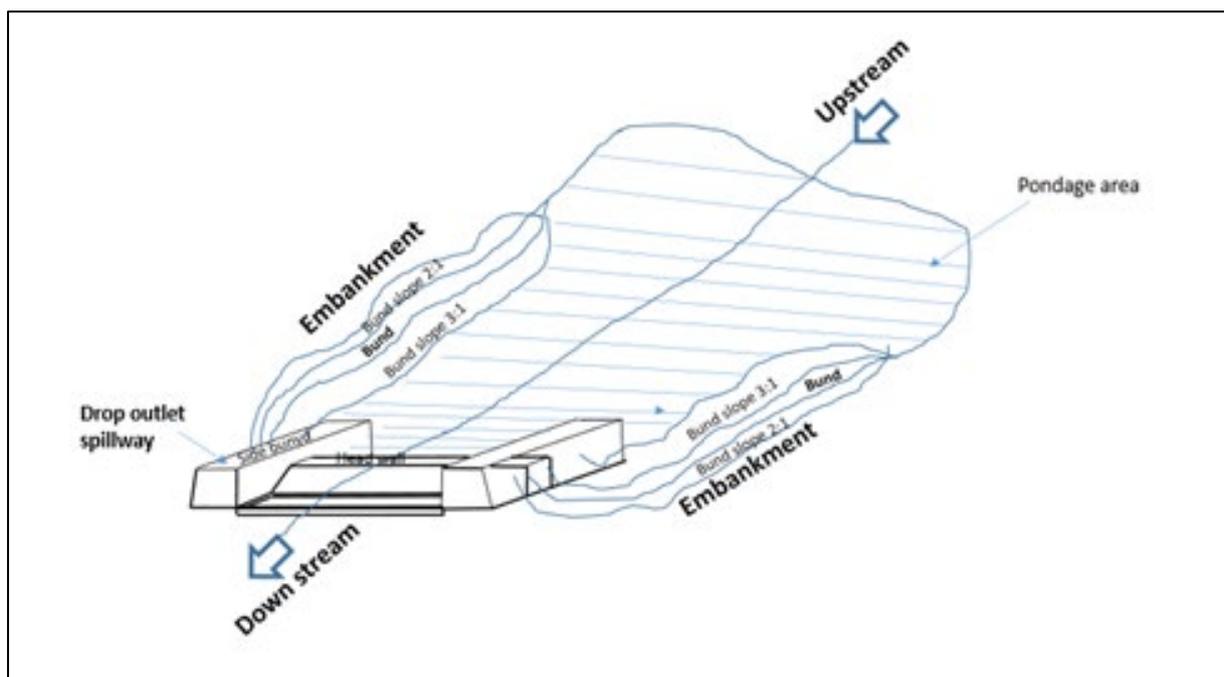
Embankment Pond with Drop outlet spillway to be constructed in the Purulia Forest Division under JICA consultancy project at West Bengal
